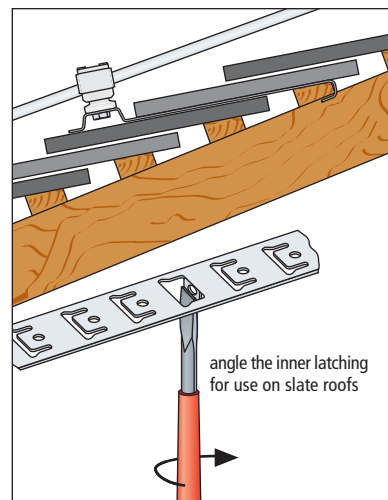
UNIsnap roof conductor holder with preformed strut – Used on slate roofs
